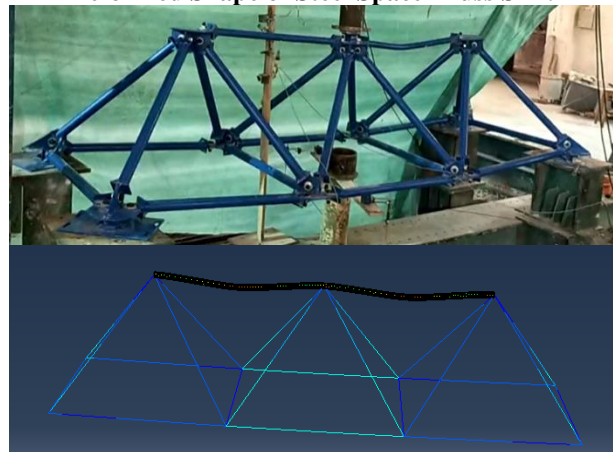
F.E. Modelling and Experimental Deformed Shape of Steel Space Truss ST1.
